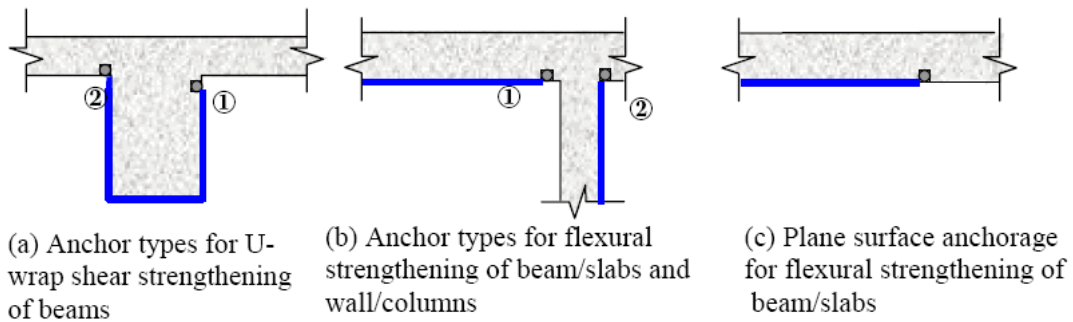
Applications of U-anchors [Khalifa et al, 1999]
